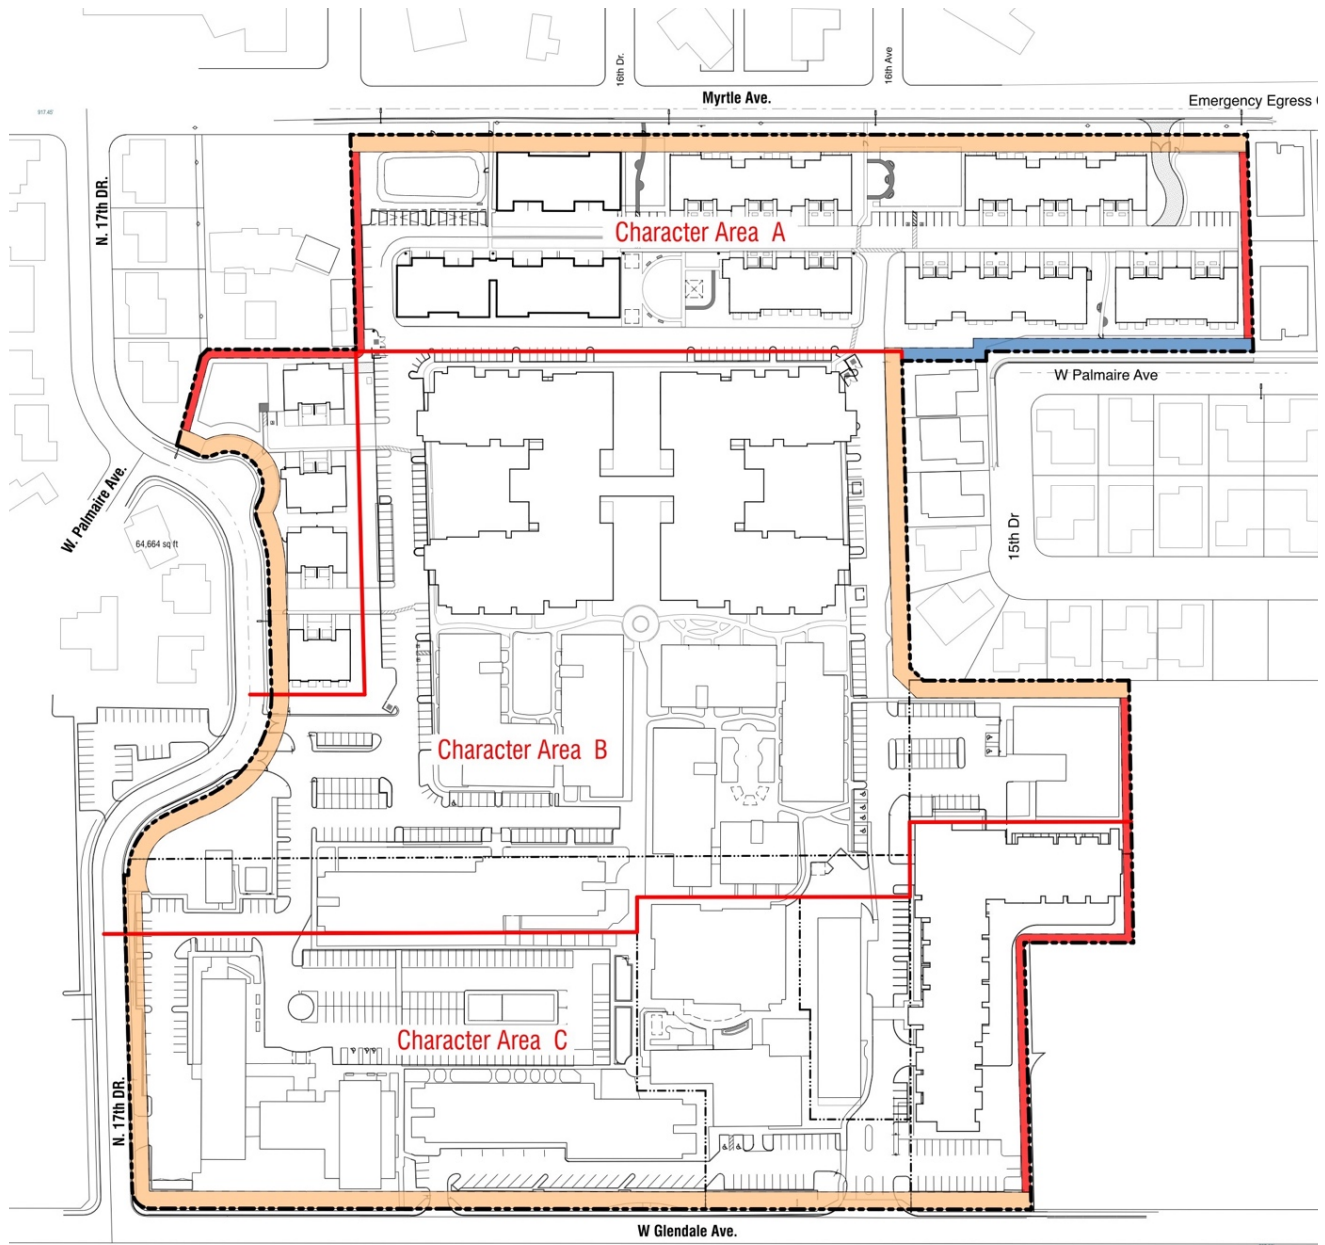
PROPOSED CHARACTER AREA PLAN
